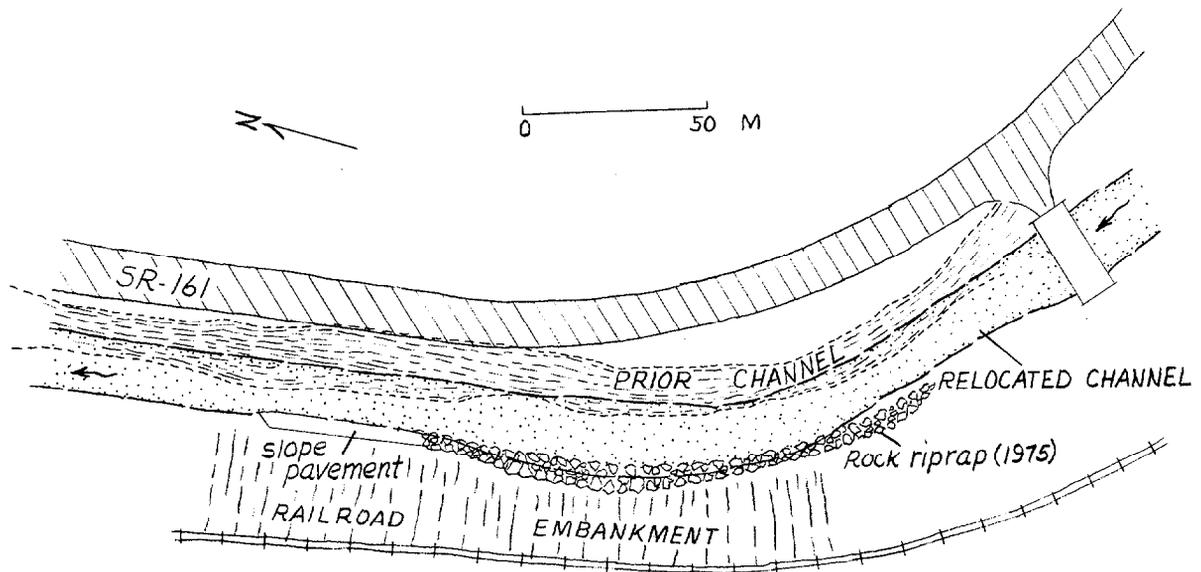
Plan sketch of channel relocation, Shamokin Creek.
